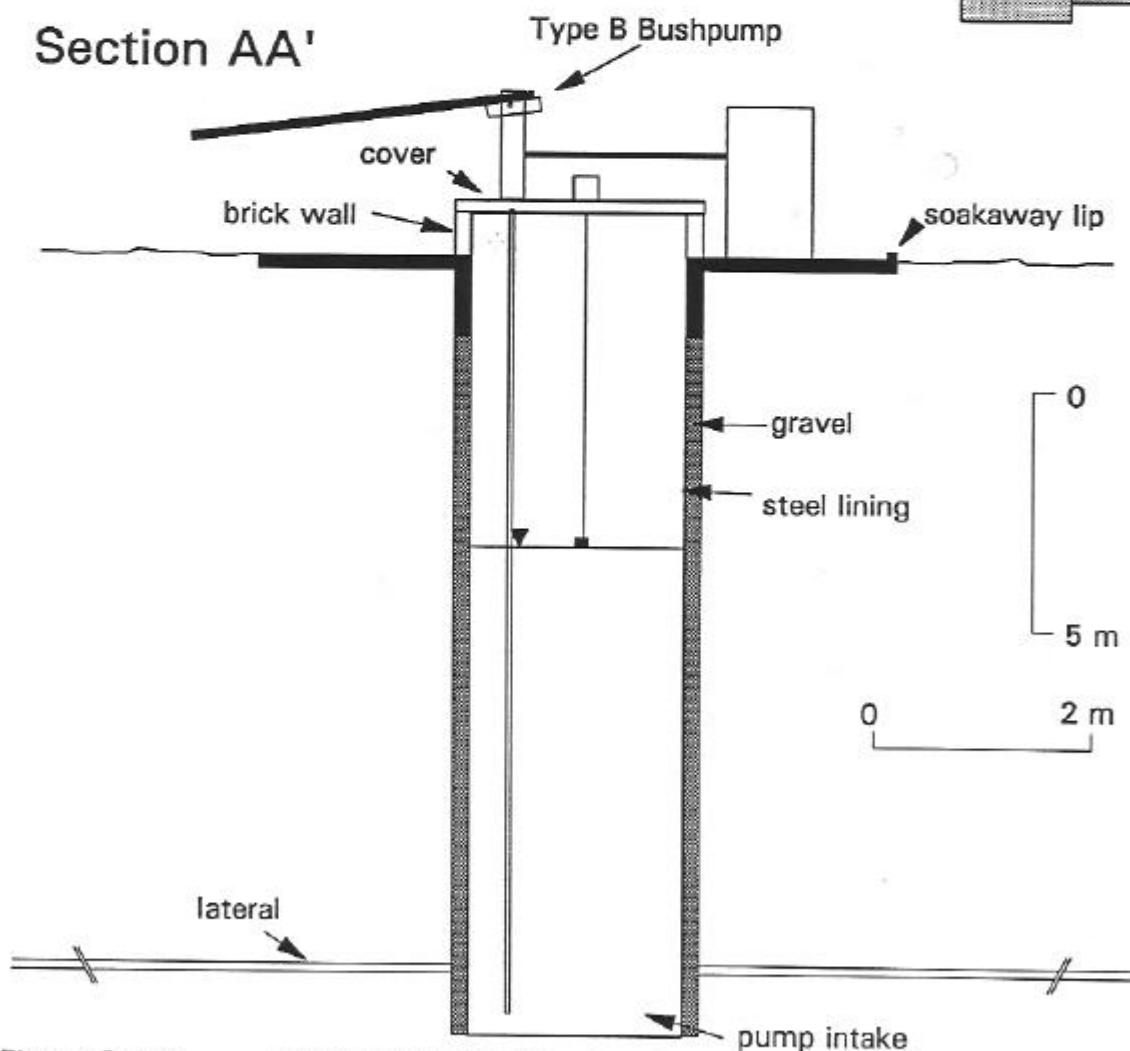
Collector well and headworks construction, site 1, Muzondidya
